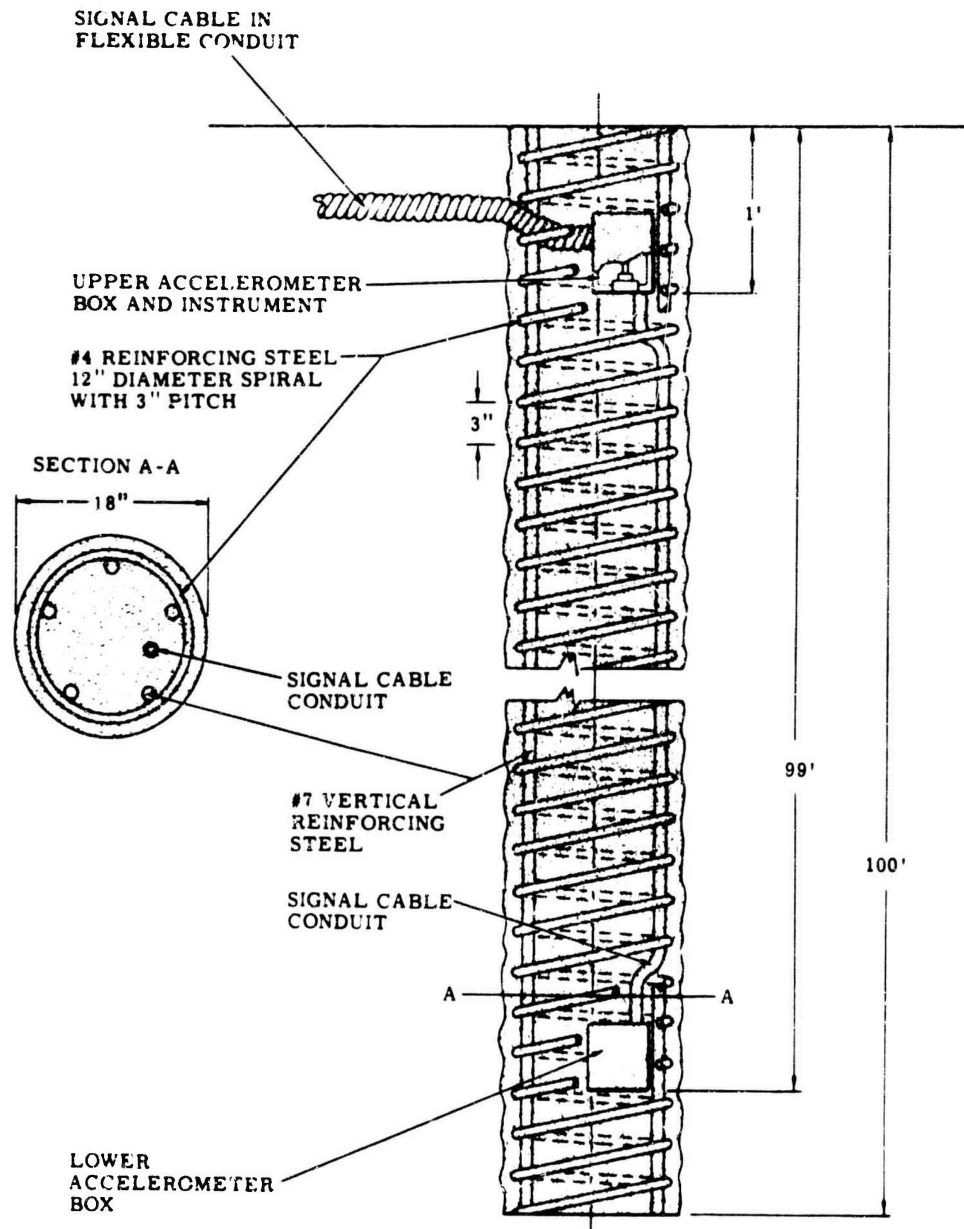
Schematic section of reinforced concrete pile, Station F-1.5-9054.
